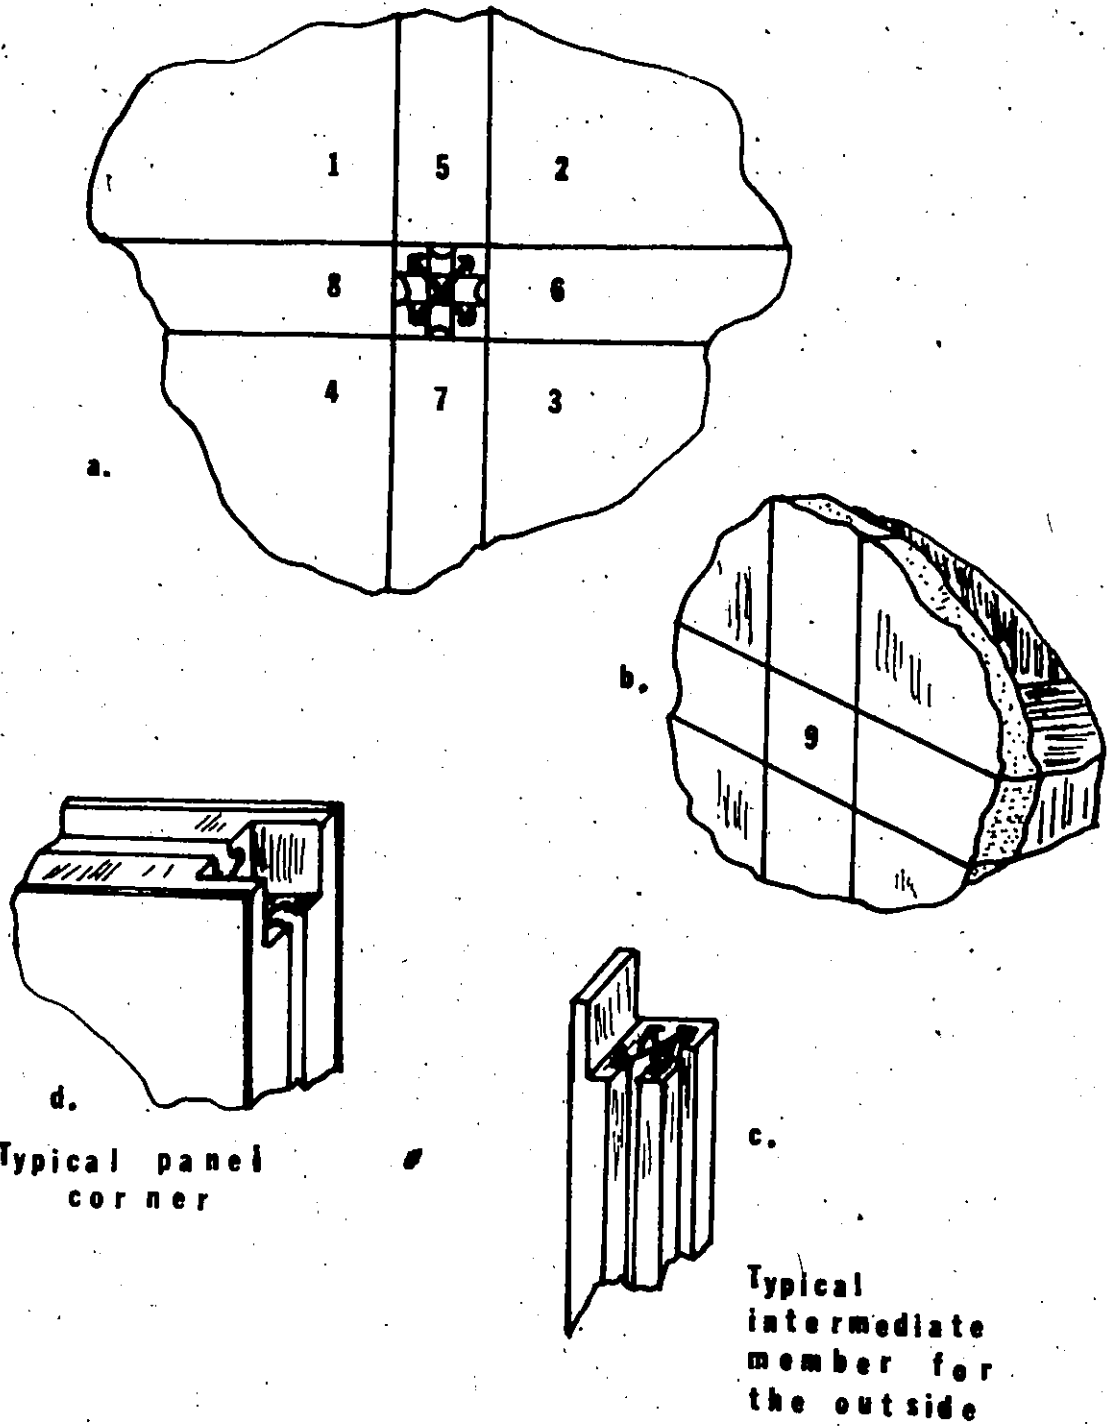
CONNECTION OF FOUR PANELS IN AN EXTERNAL WALL
